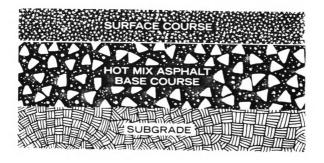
Typical full-depth asphalt pavement cross-section for residential roads and streets.
